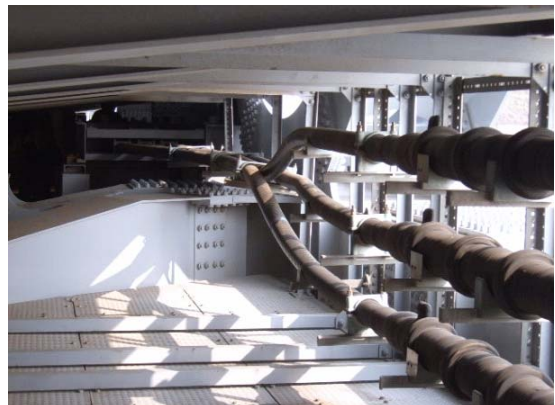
154kV power cables installed on Yeong-Jong bridge showing the snaking arrangement for bridge movement, joint installation and cable snaking in general.
